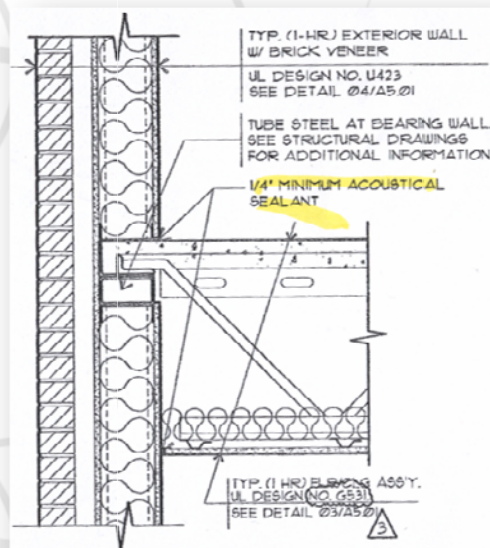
Typical 1- HR Exterior Wall with Brick Veneer
